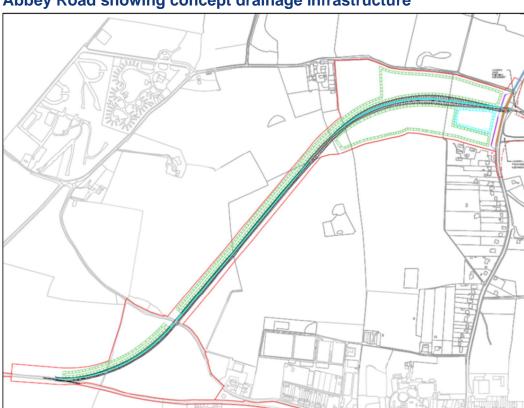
Green rail route from Leiston branch junction to B1122 Abbey Road showing concept drainage infrastructure
